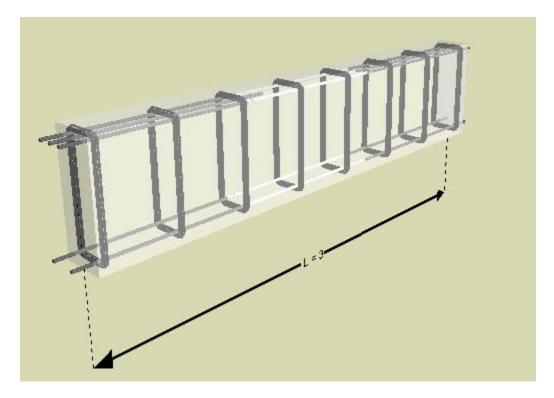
3D layout of the reinforced concrete beam.
